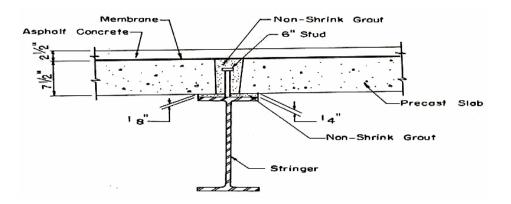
Deck/Superstructure connection details of the Delaware River Bridge
